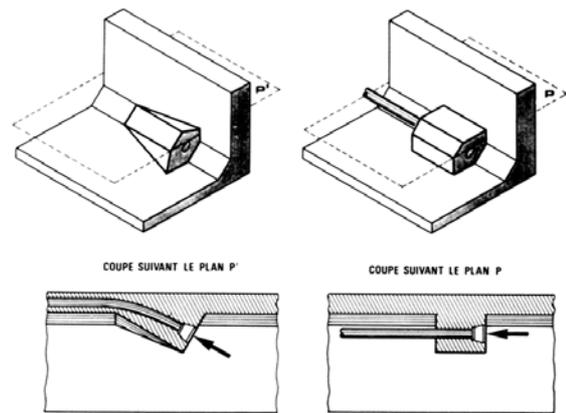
Comparison of anchorage details for internal and external prestressing. (AFPC)
